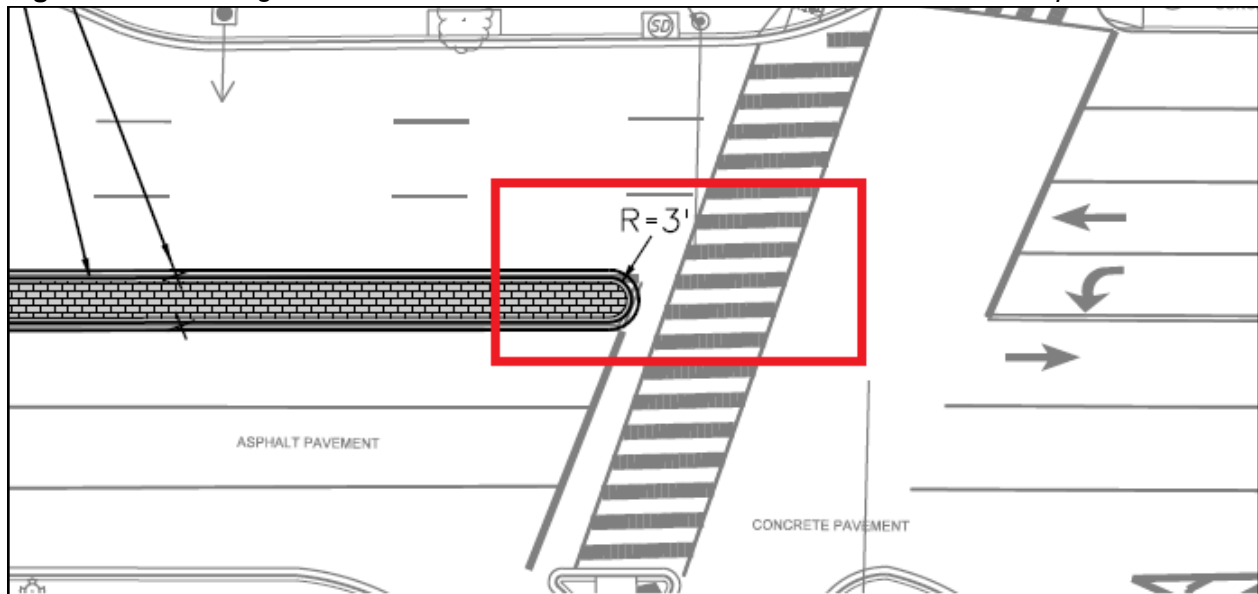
Current Conditions at the Intersection of New York Avenue and First Street NW
